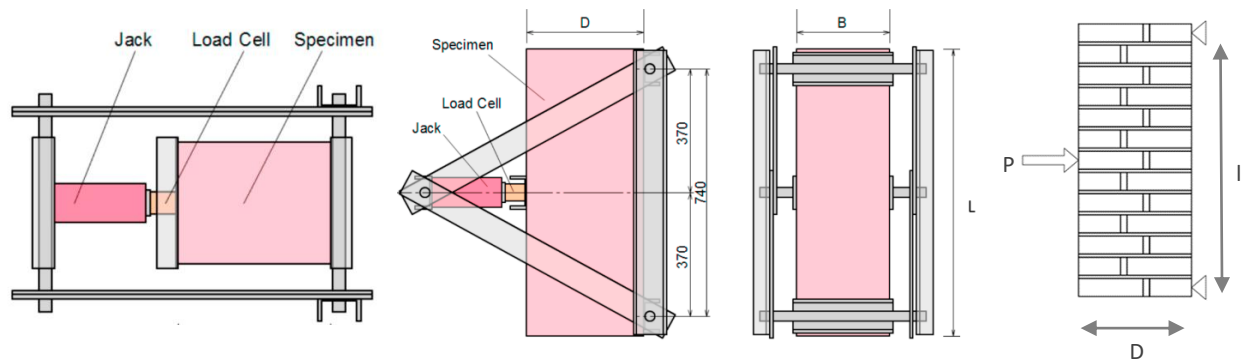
Loading arrangement of three-point bending test on masonry prisms (Dimensions are in mm)
